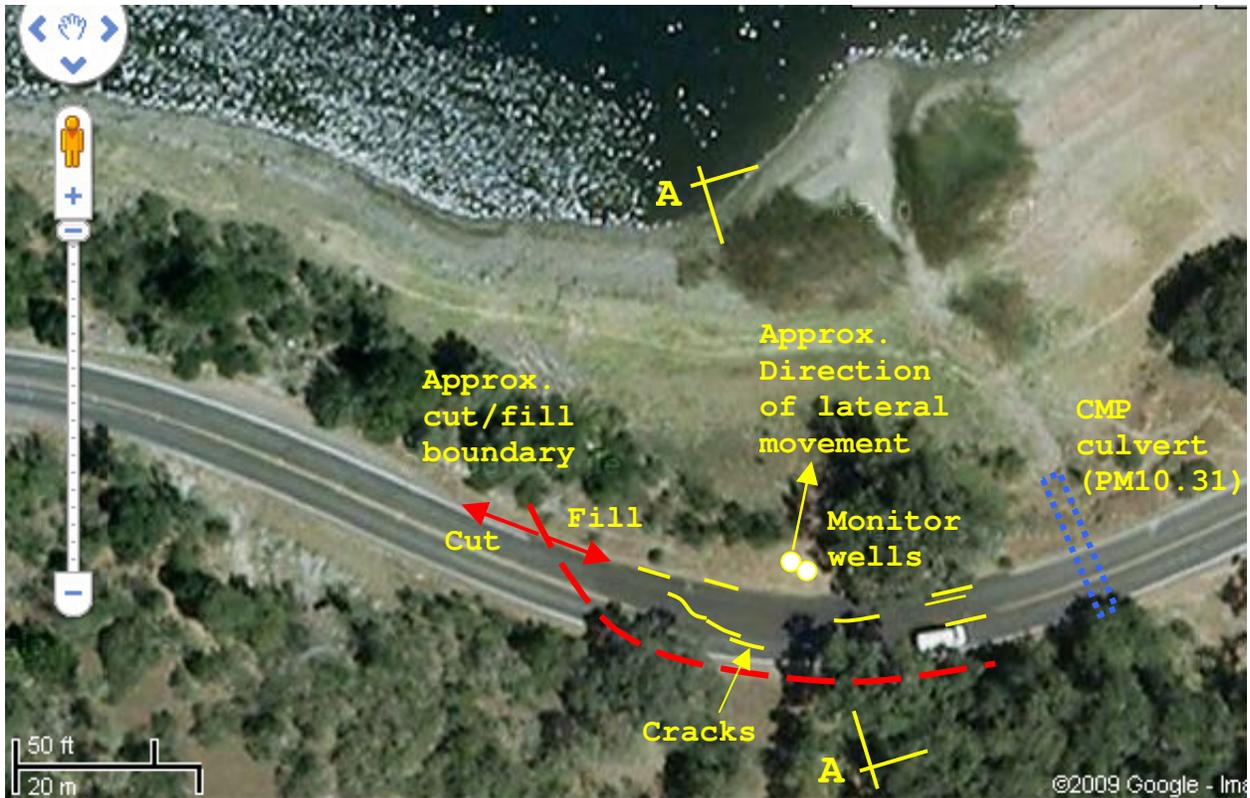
Plan view of project site (see Fig. 3 for cross section A-A).
